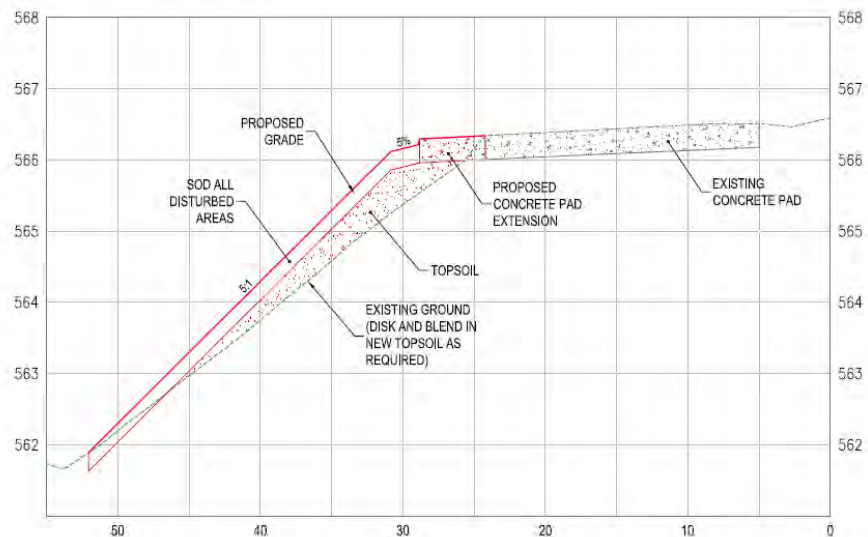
The BNA Sign Pad Extension Grading Plan Excerpt [17]
